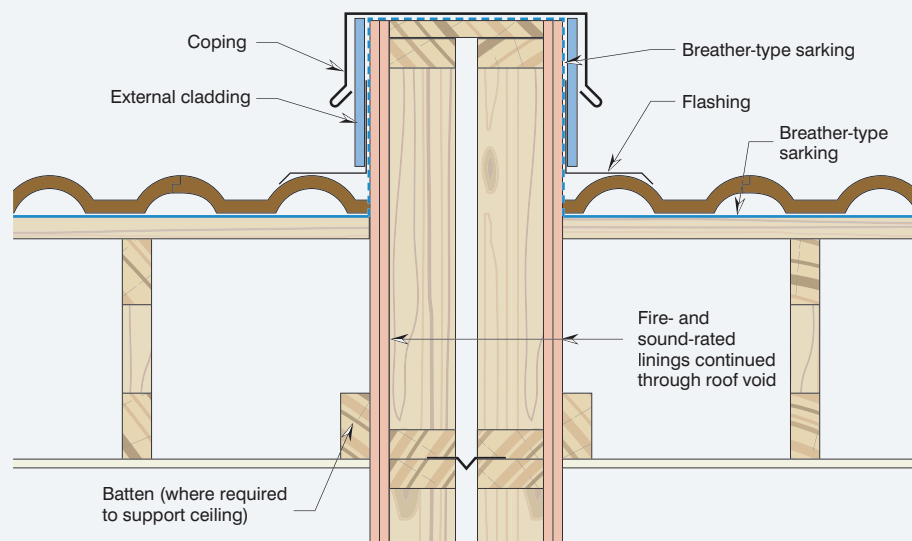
Double stud fire- and sound-rated wall in roof void to form parapet – FRL 60 minutes – elevation view.
